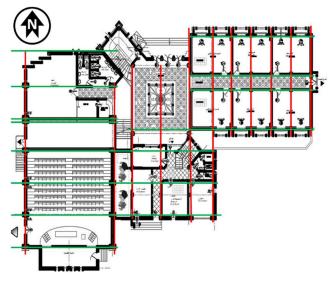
Ground Floor plan- source: Architectural Office Khelili Abd Hafid + Student
